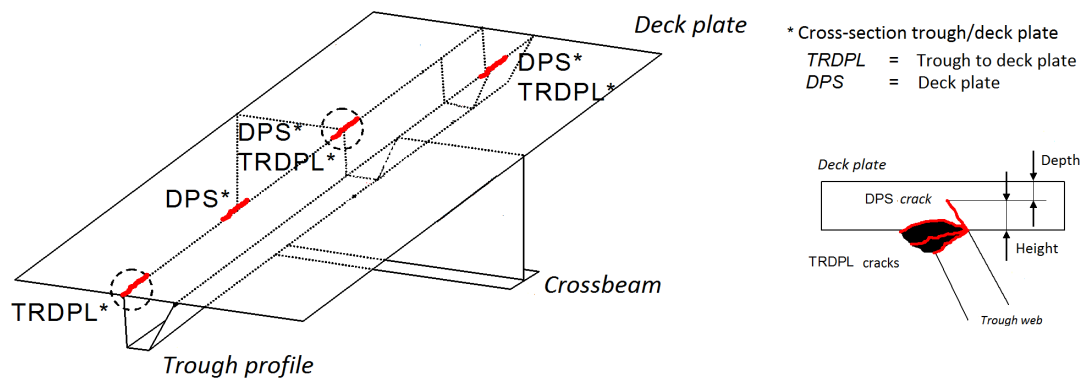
Three-dimensional view of the bridge considered cracks' location (left); longitudinal cross-section with 'trough to deck plate' (TRDPL) crack location (right);.
